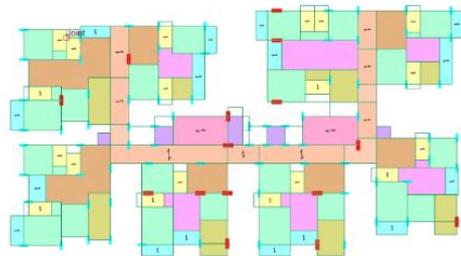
Building Plan.2: GF,2<sup>nd</sup>,5<sup>th</sup>,8<sup>th</sup> and 11<sup>th</sup> Floor
